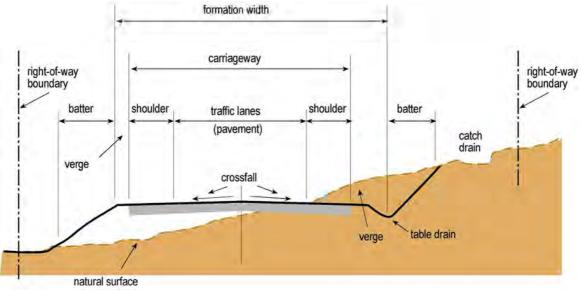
Road Cross Section Elements (Source Austroads 1989)
